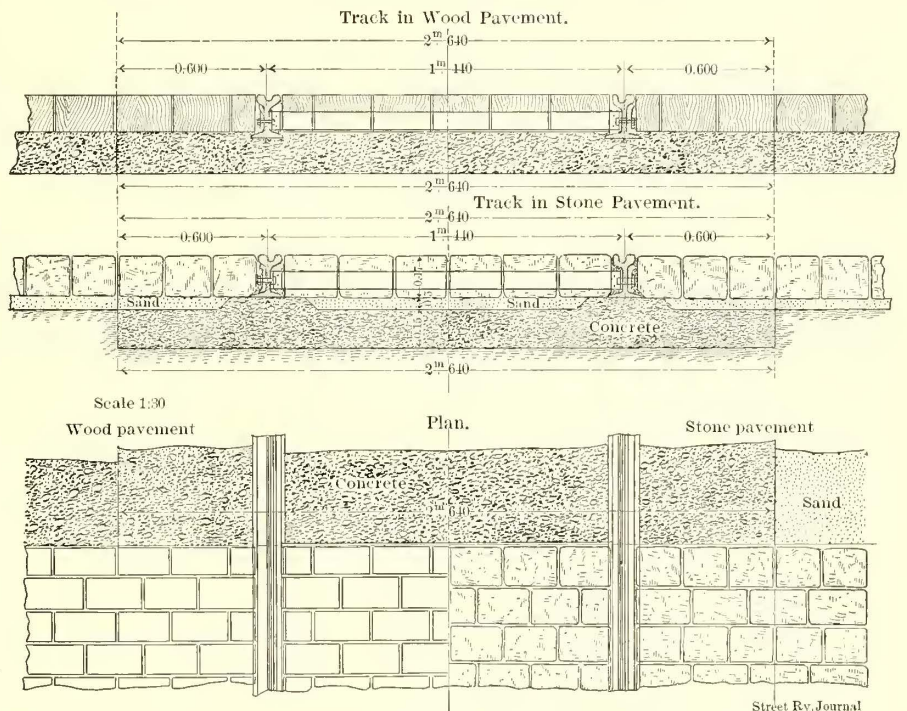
CROSS SECTIONS OF TRACK USED BY A PARIS TRAMWAY
